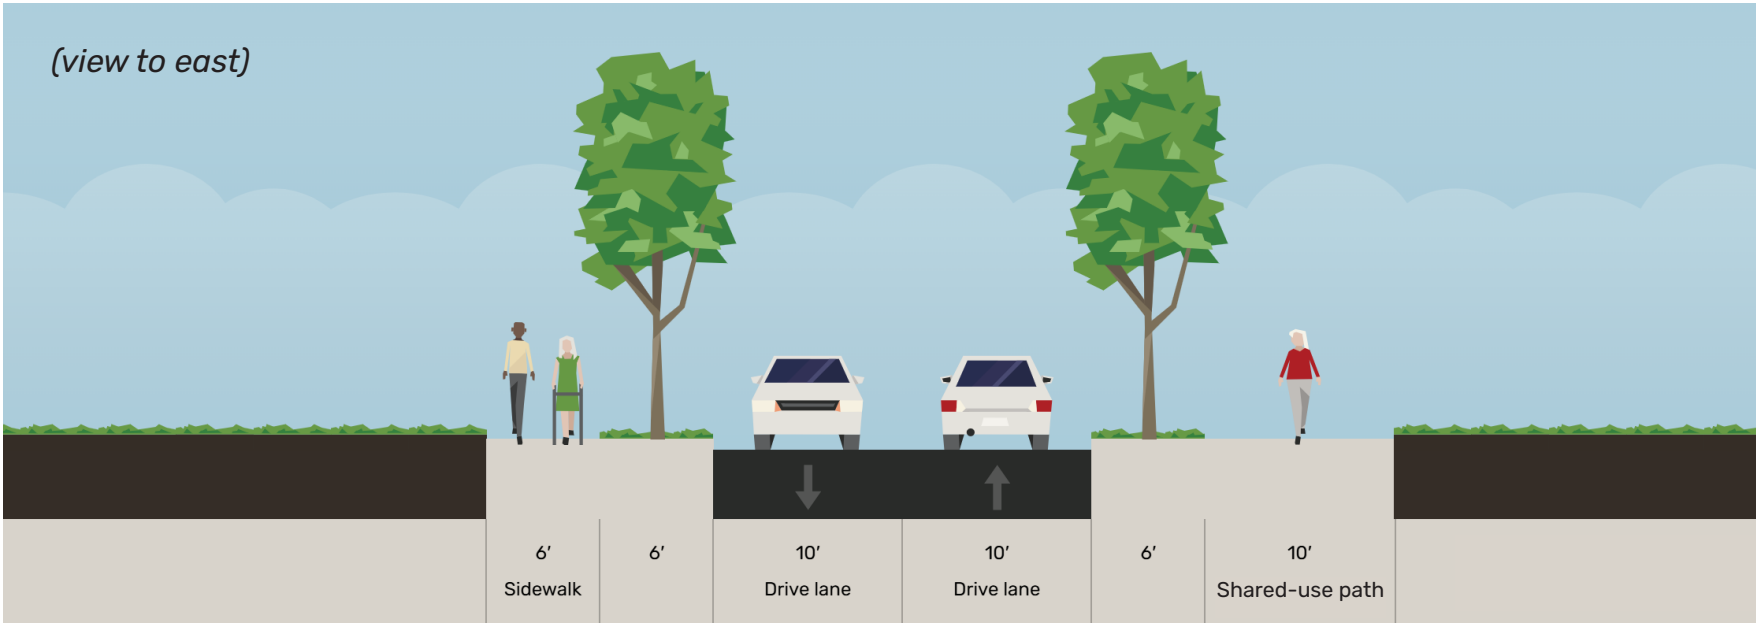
Proposed Typical Cross-Section on Fritz Lane (48' ROW)
